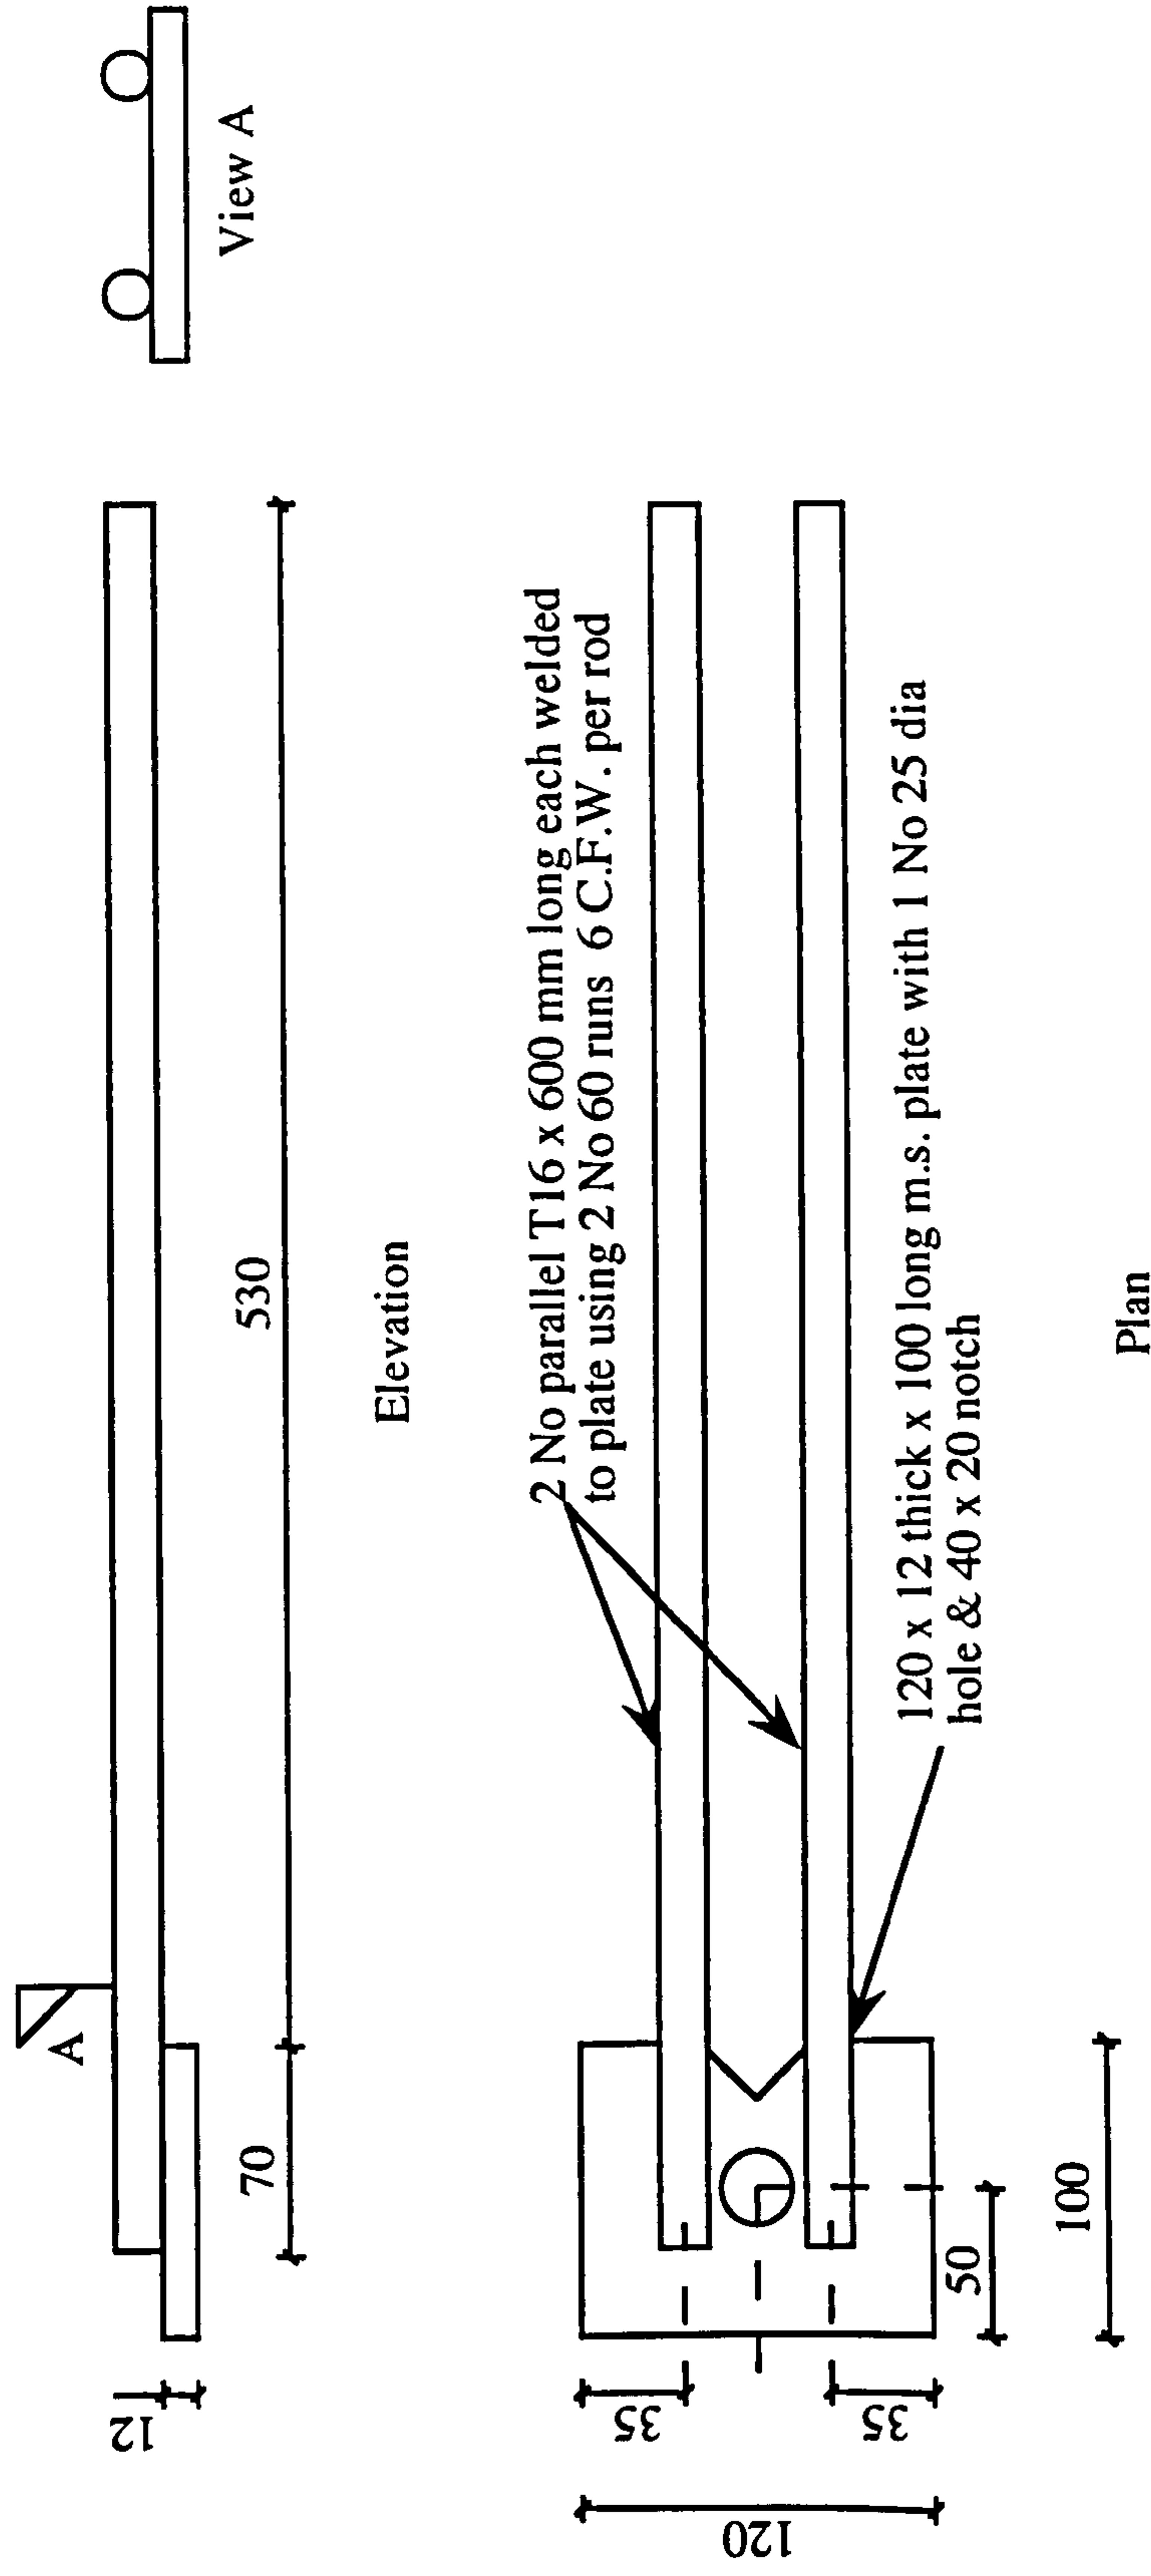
Details of beam end plate for bolted billet connection (see Fig. 5.13(a))
